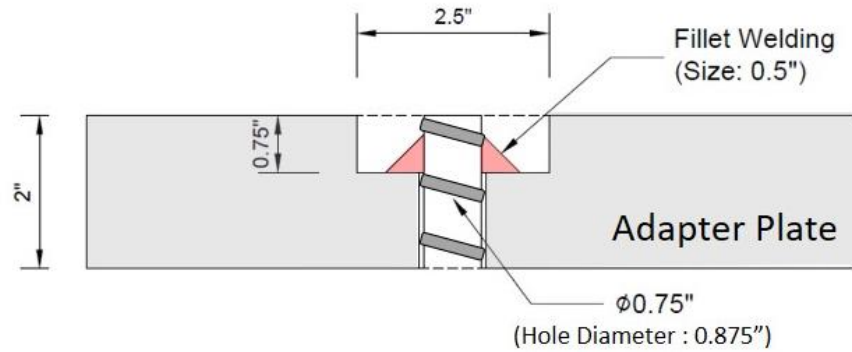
Detail of connection between drilled shaft reinforcement and adapter plate
